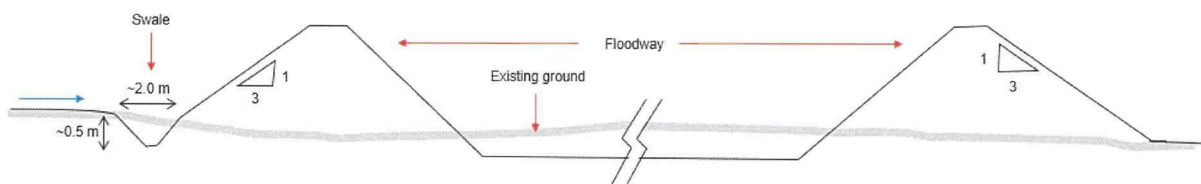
Typical section through the floodway, showing the stopbanks and the swale (view looking north/upstream).
